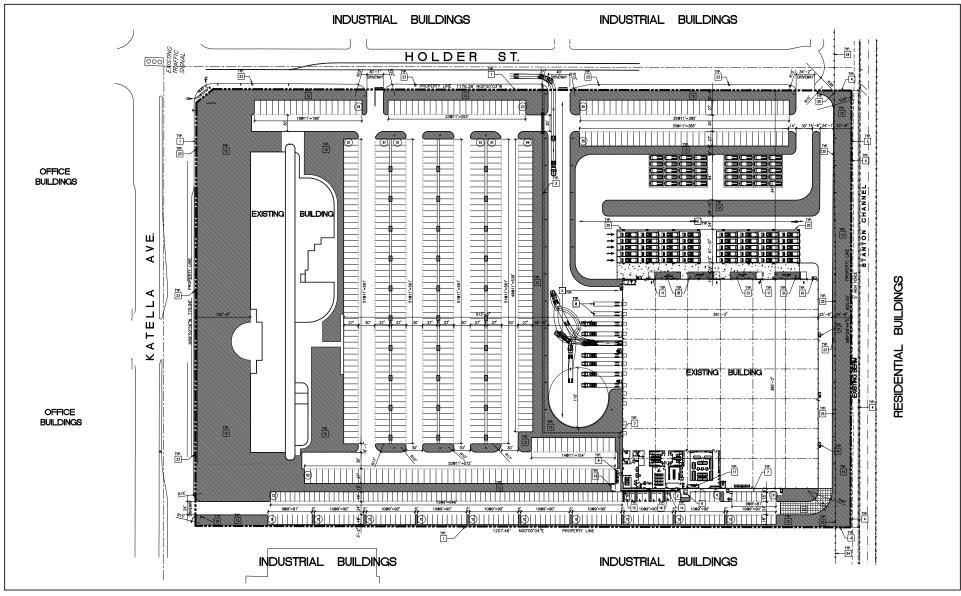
Conceptual Site Plan Fire Protection Questionnaire
